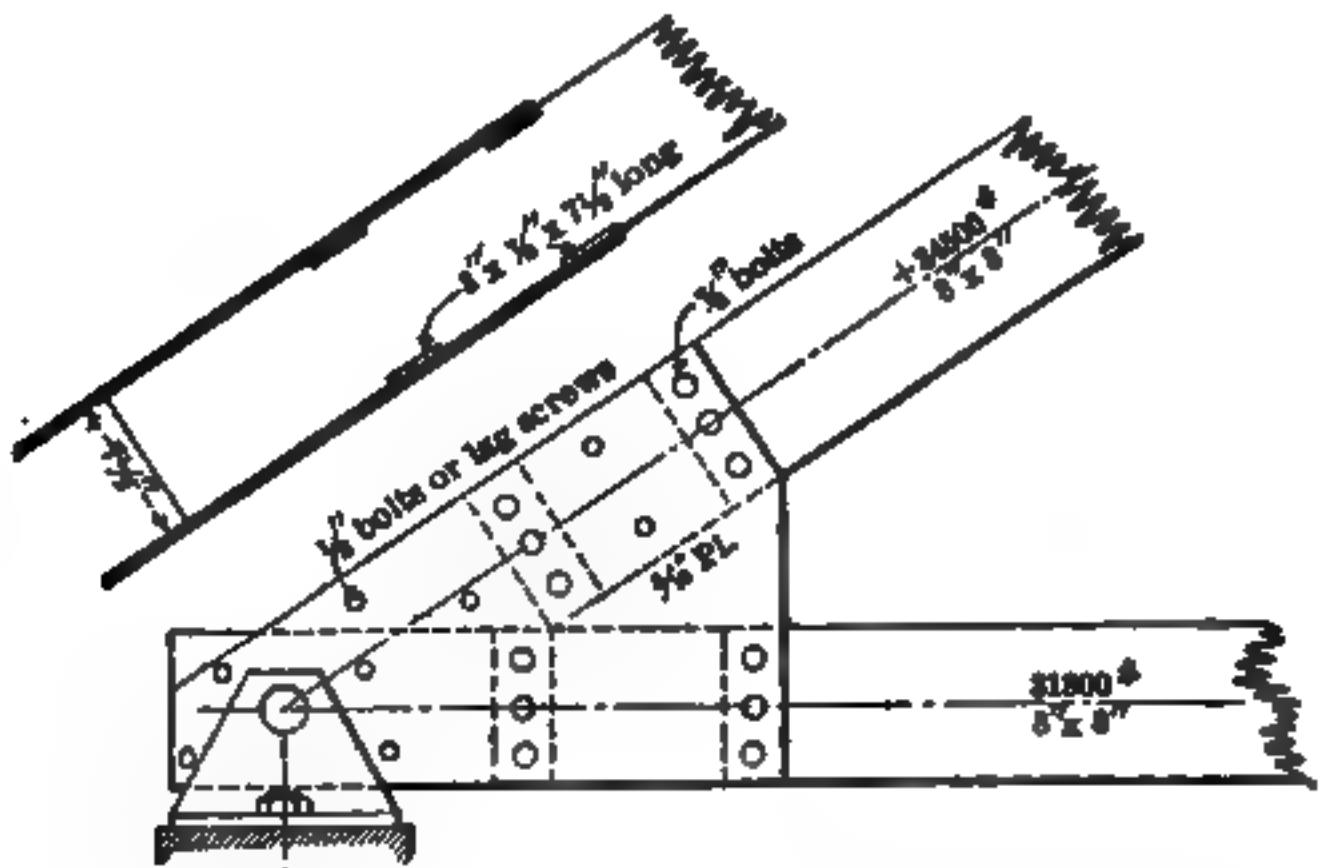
Detail of Joint 1, of Truss Similar to Fig. 1
